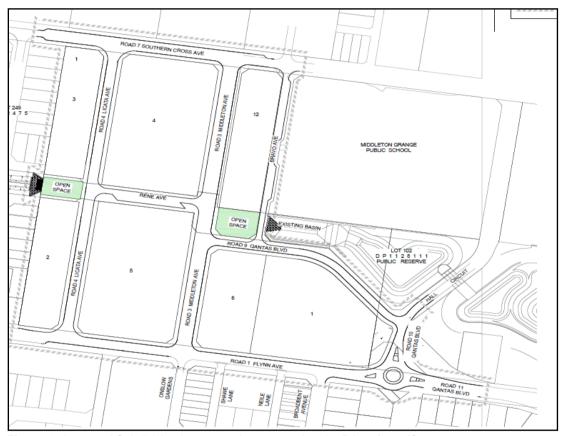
Approved Subdivision Layout works approved under DA-64/2007/C
